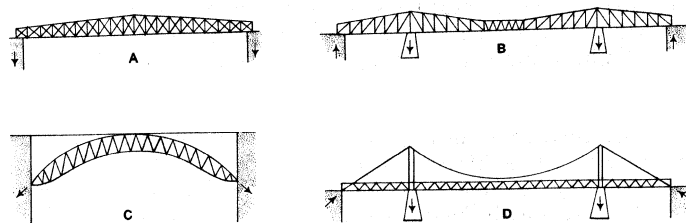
PRINCIPAL TYPES OF BRIDGES: (A) SIMPLE GIRDER; (B) CANTILEVER; (C) ARCH; (D) SUSPENSION. ARROWS SHOW FORCES BRIDGE EXERTS ONTO OR AWAY FROM FOUNDATIONS
